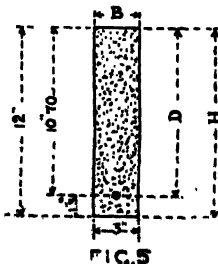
represents a section of the proposed beam, the dimensions being as there stated, and the reinforcement consisting of a steel rod or bar.
